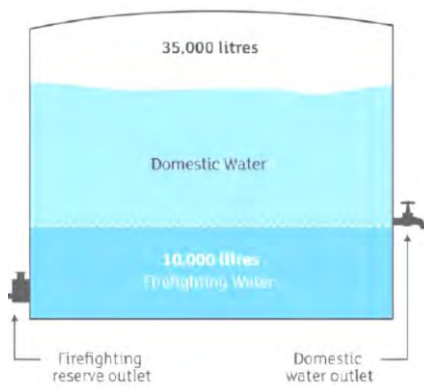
Firefighting water and domestic water can be in shared tank (DTPLI 2014)
